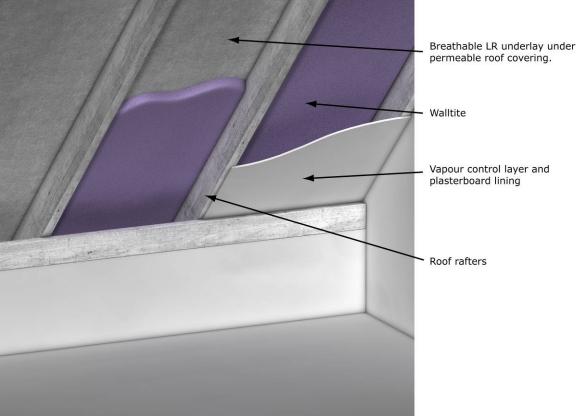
Pitched Roof Construction: Breathable LR underlay
